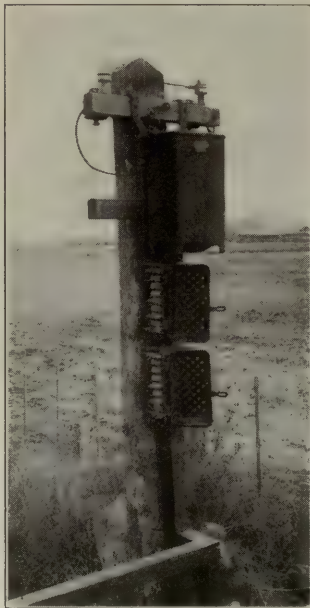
Track Feed Location. Resistance Grids Mounted Below Transformer.
